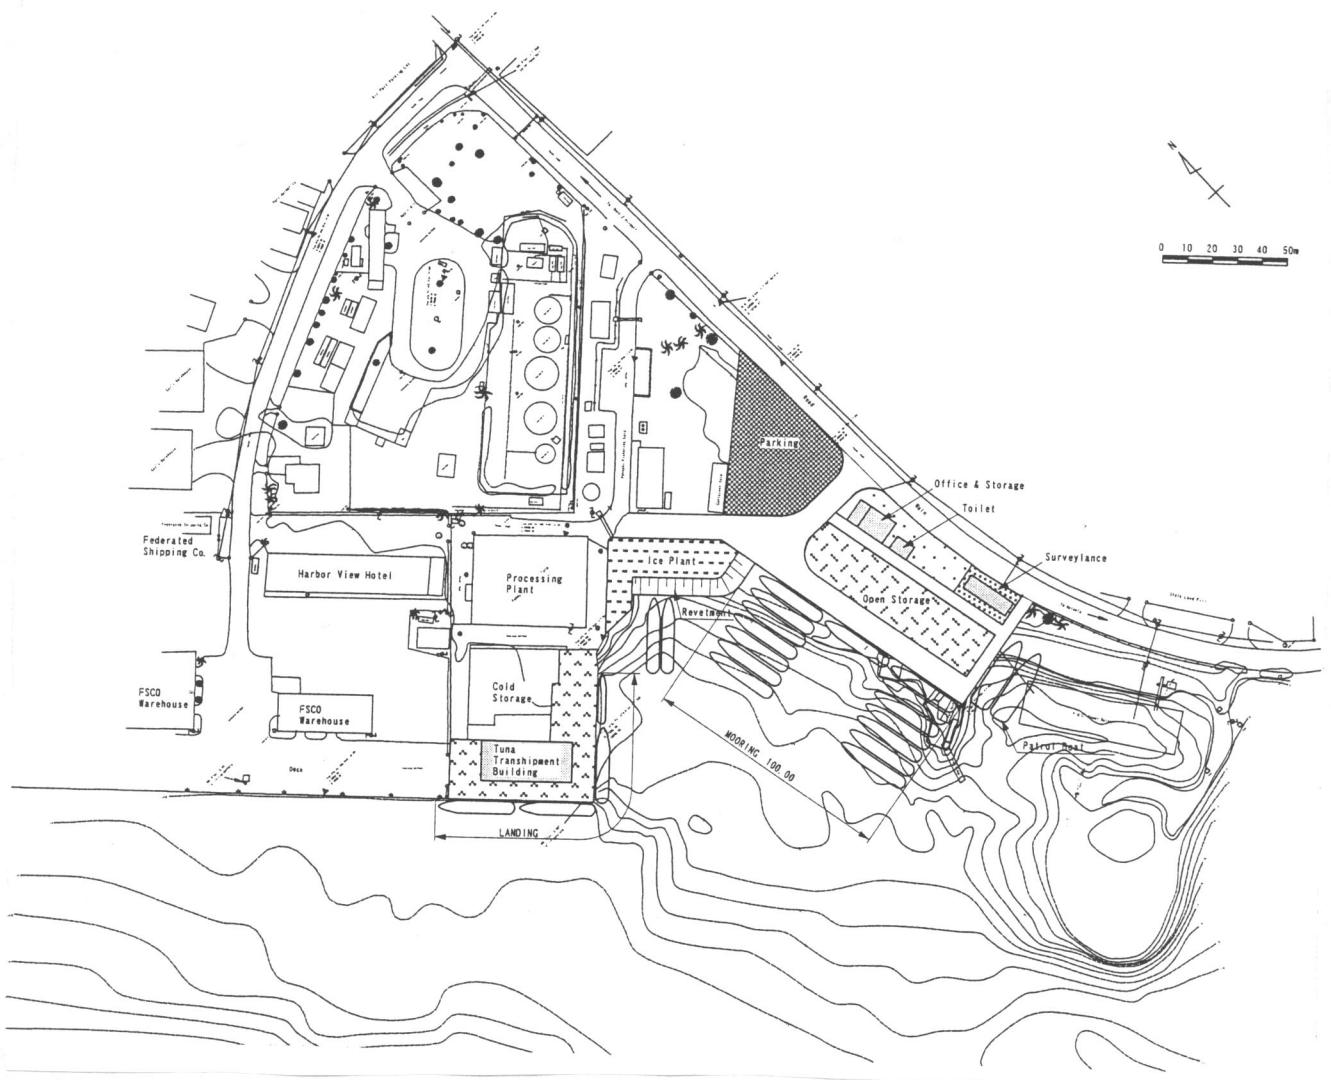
Basic Layout Plan of Takatik Fishing Port
